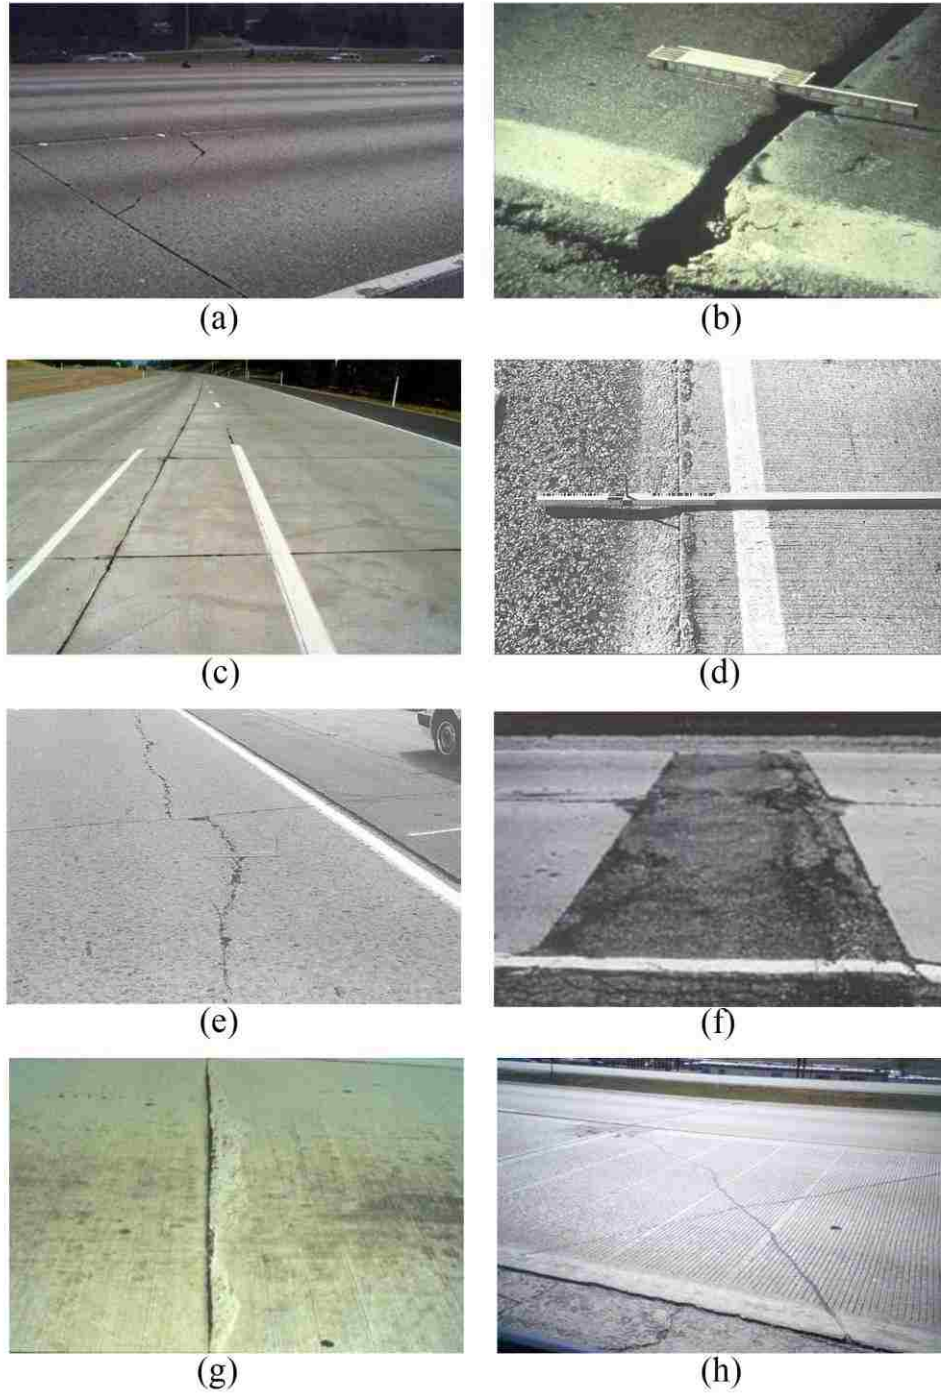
Illustration of rigid pavement surface distress; (a) corner break; (b) faulting of transverse joints and cracks; (c) joint seal damage; (d) lane/shoulder drop off; (e) longitudinal cracking; (f) patch deterioration; (g) spalling of joints and cracks; (h) transverse and diagonal cracks.
